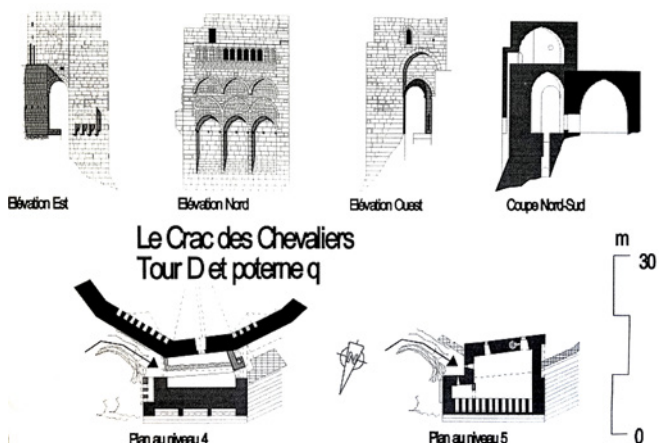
Crac des Chevaliers, plan, elevation and section of the latrine tower (Mesqui 2003, Plan n&b Crac).
